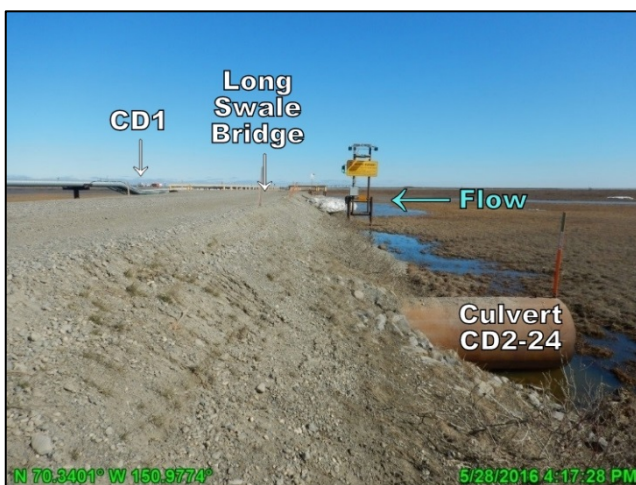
CD2 road at culvert CD2-24, looking east; May 28, 2016
